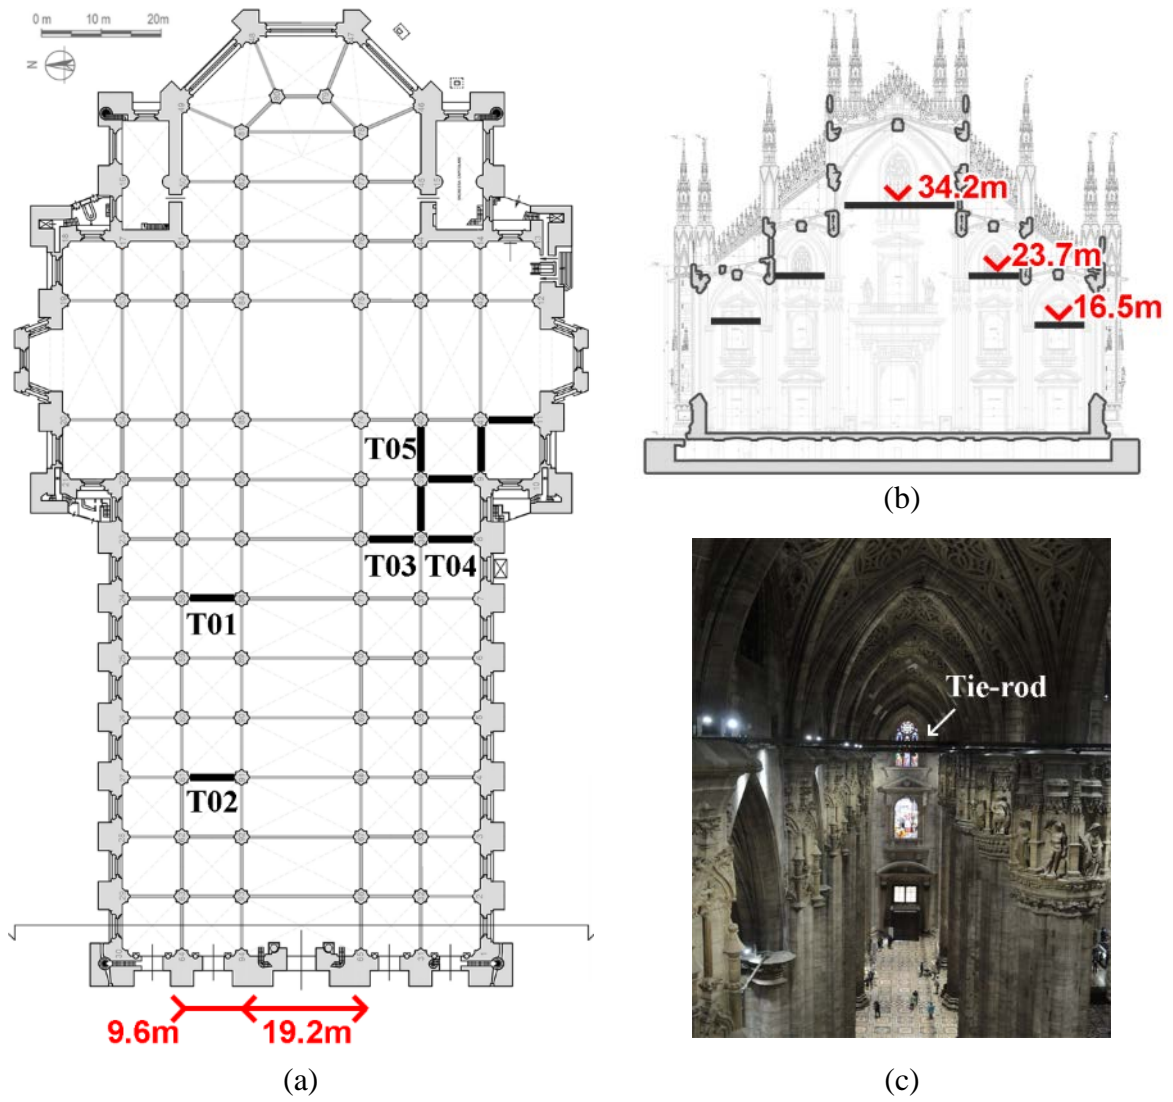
Milan Cathedral, (a) plan, (b) section, (c) internal view
